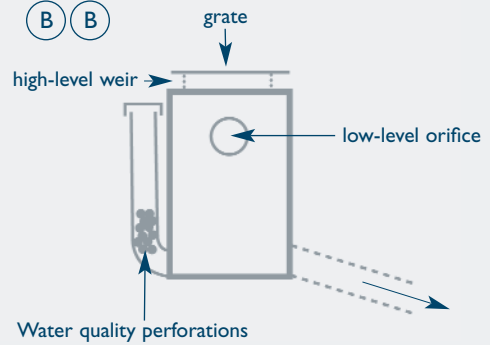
Stormwater Retrofit in Highway Right-of-Way
